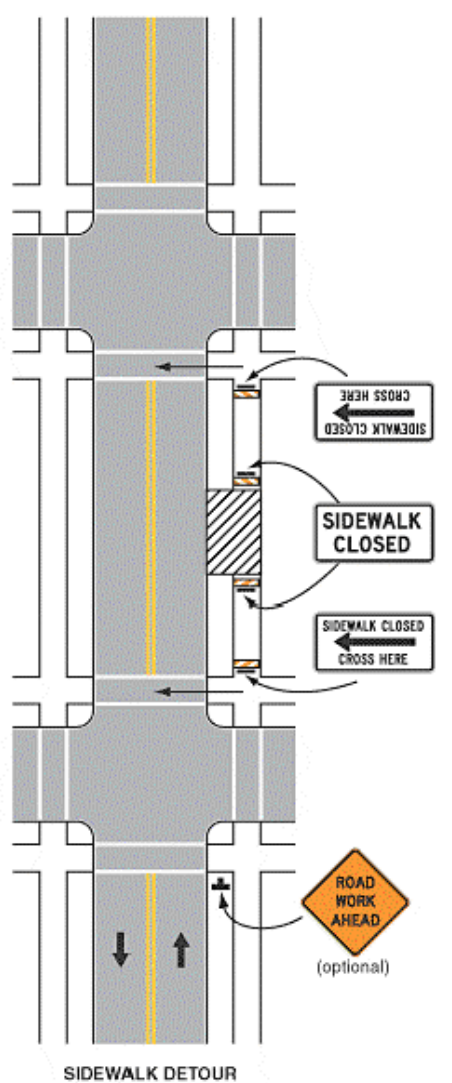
H-28. Sidewalk Detour or Diversion (TA-28)
